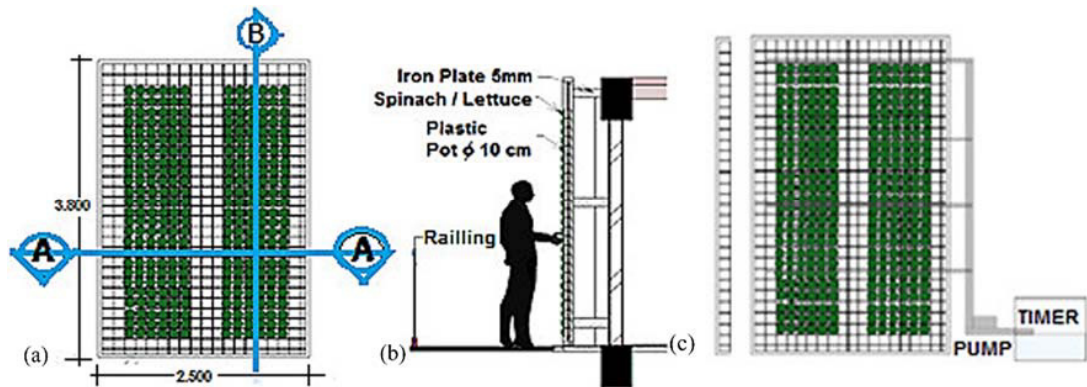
Urban farming application on the wall: (a) elevation, (b) section, and (c) irrigation system
